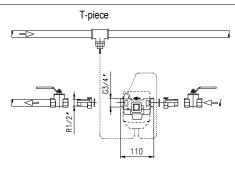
Example of integration with T-piece and meter with 110mm fitting
